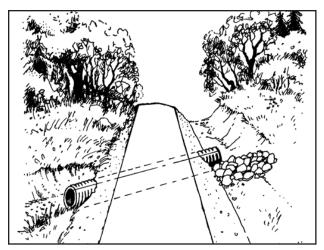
Cross drain culverts reduce erosion by controlling road surface runoff and maintaining natural drainage patterns. (Source: Texas Forestry Best Management Practice Handbook.)
